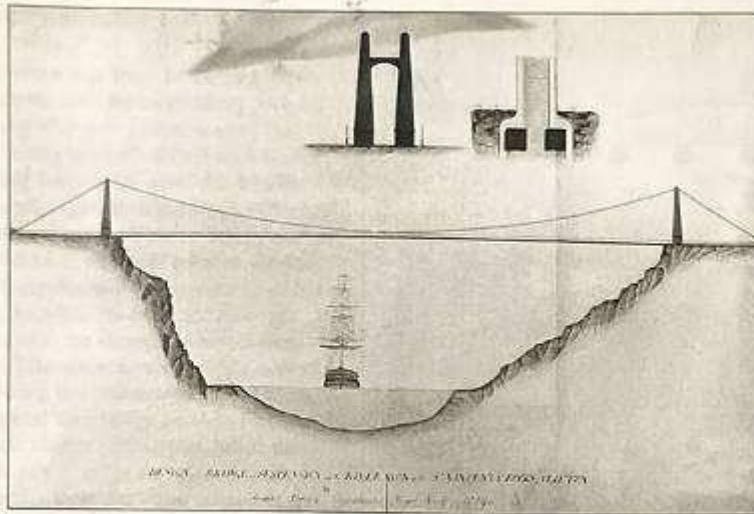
Captain Brown's design for Clifton Bridge, Bristol, 1829-30³³ (Private Collection)
